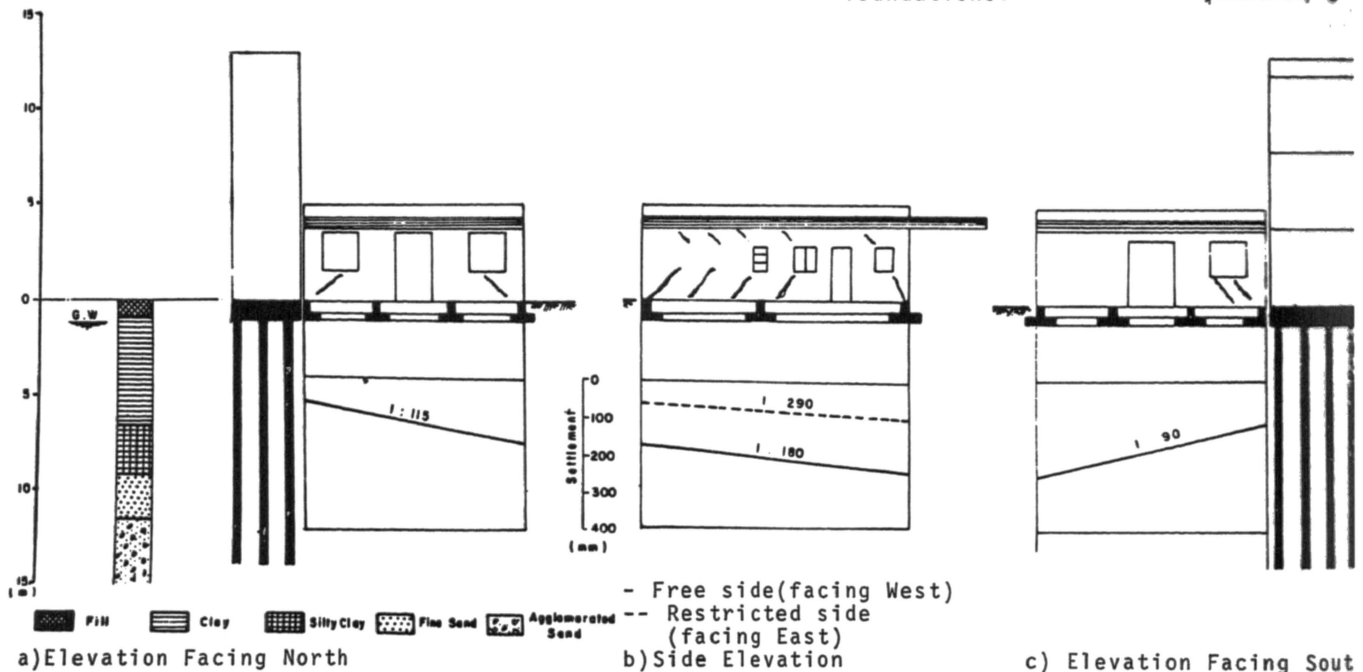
Soil Profile, Settlements below Foundations and Cracks in the Facades of the Annexe.
